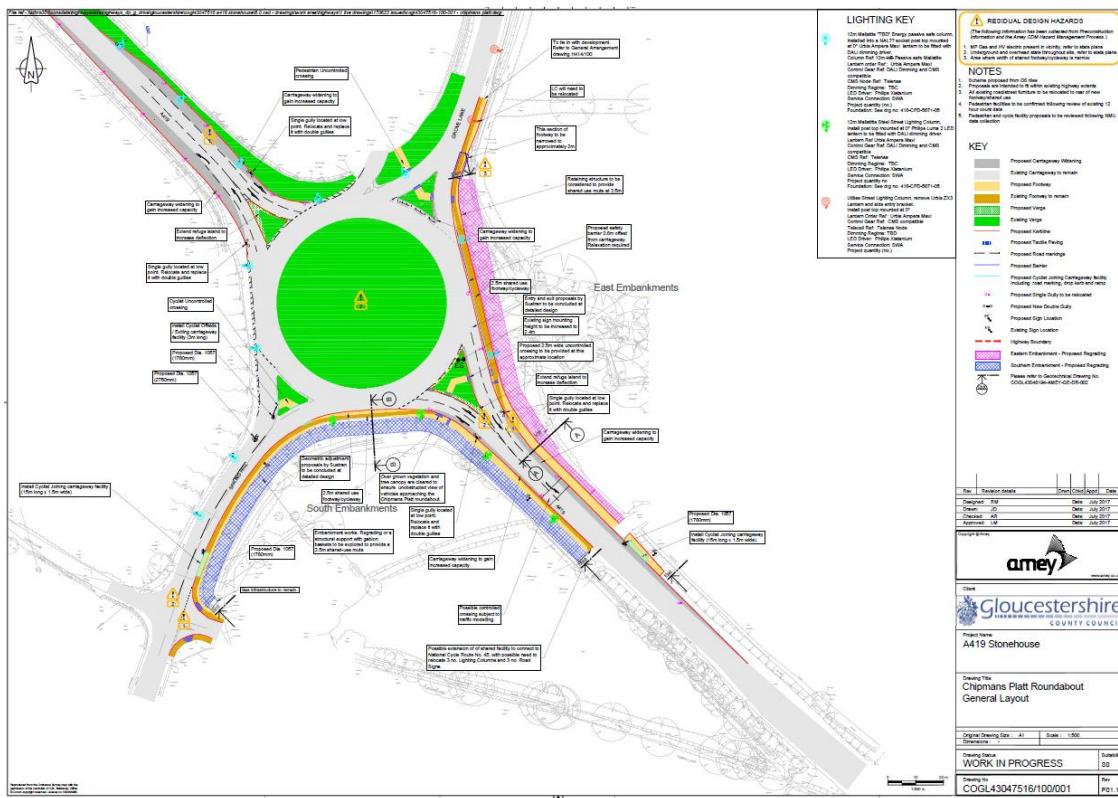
Proposed improvements at Chipman's Platt Roundabout (see Appendix A)
